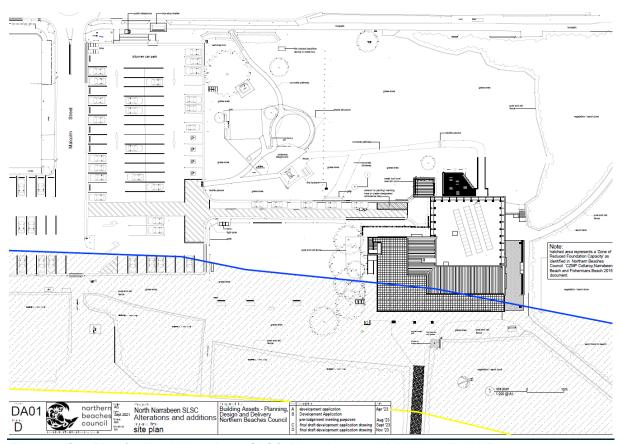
Site Plan for North Narrabeen SLSC Alterations and Additions (DA01-D)
